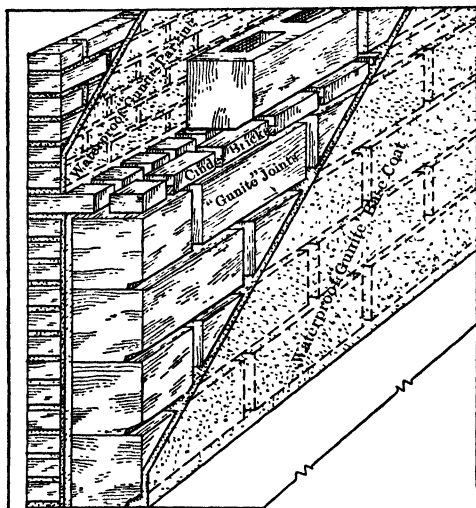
Weldcrete Wall of Cinder Units and "Gunite"
